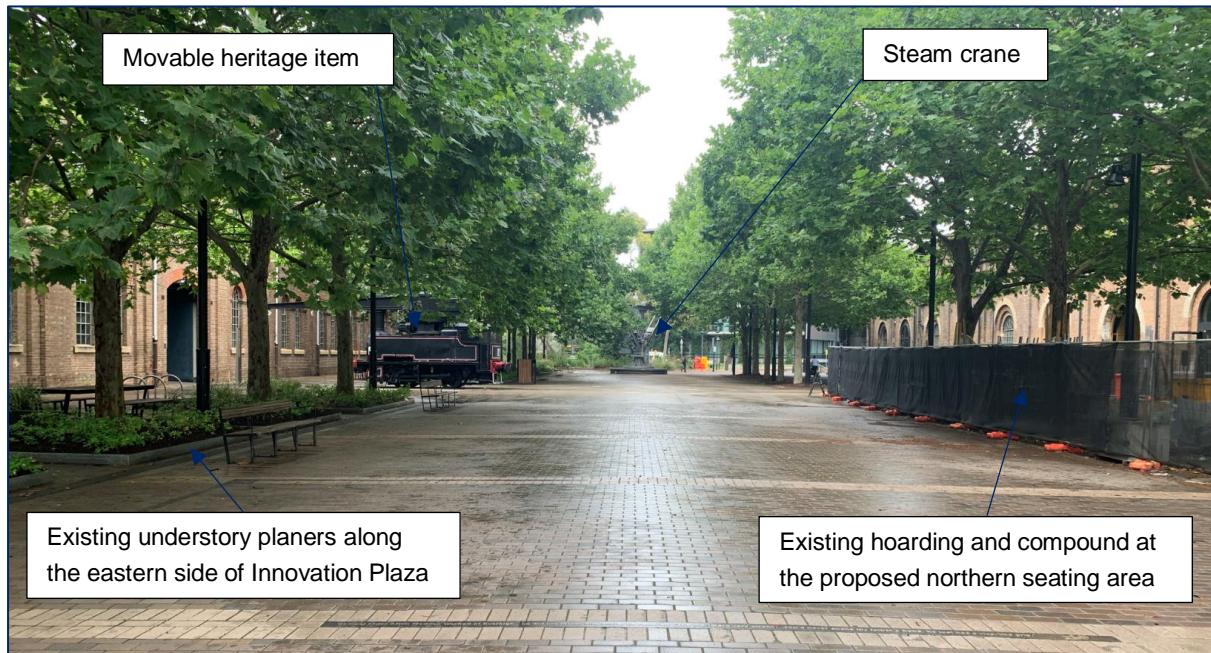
| Innovation Plaza looking south towards Locomotive Street (Source: DPE)
